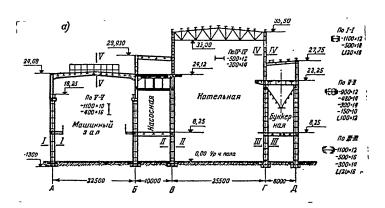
Transverse steel frames of the main power plant building with steel sections for a rigid-frame connection design (as per scheme 1 - fig. 2).
